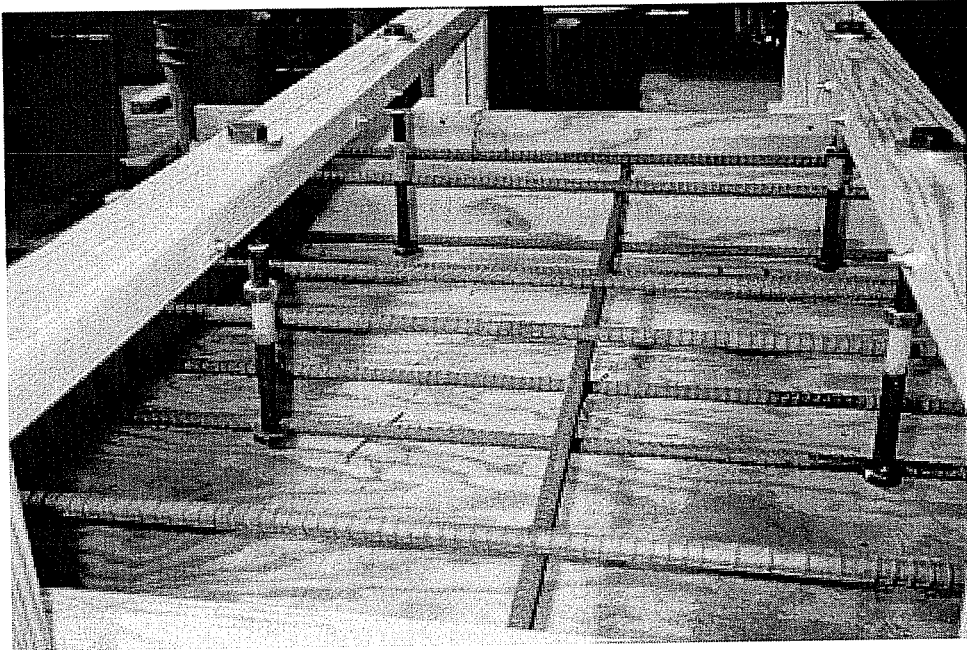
Wooden Frame Work used to Hold Cast-in-Place Anchors Prior to Casting of Tension Tests
